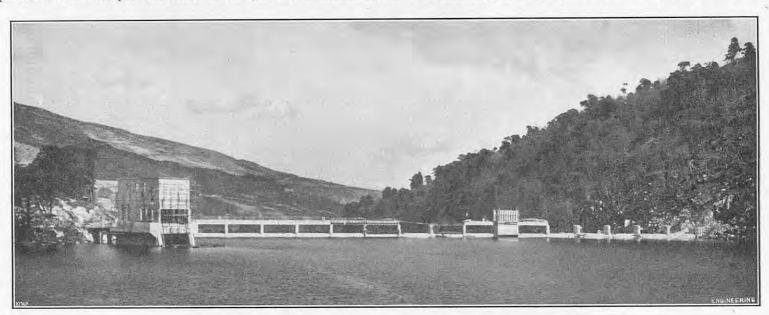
Beinn a Mheadhoin Dam, Looking Downstream.
